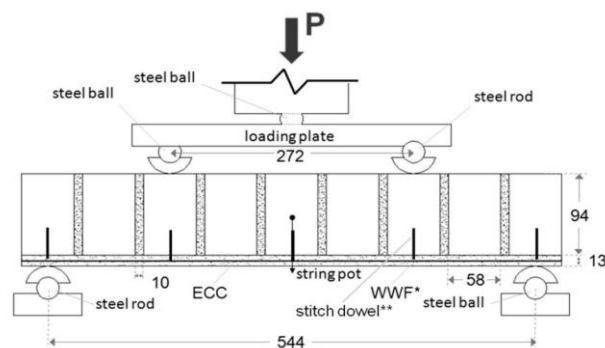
Four-point bending test set-up of ECC strengthened masonry beams [57]
